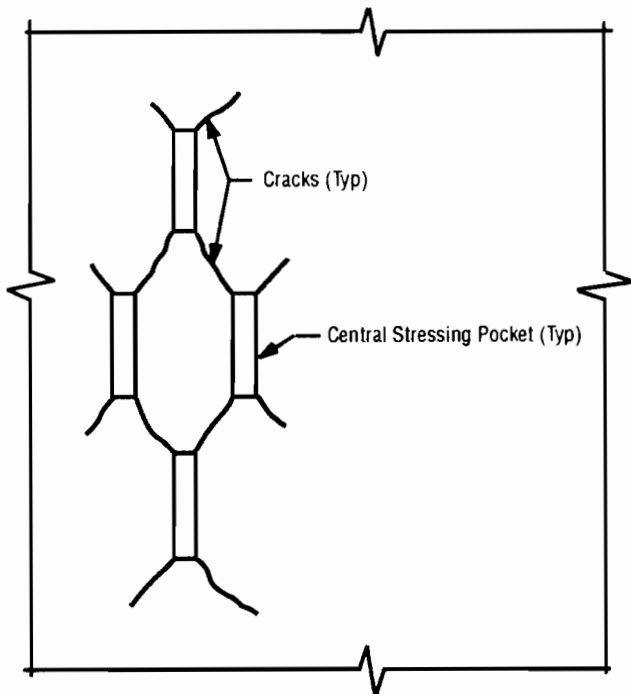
Typical cracking patterns observed around central stressing pockets.
